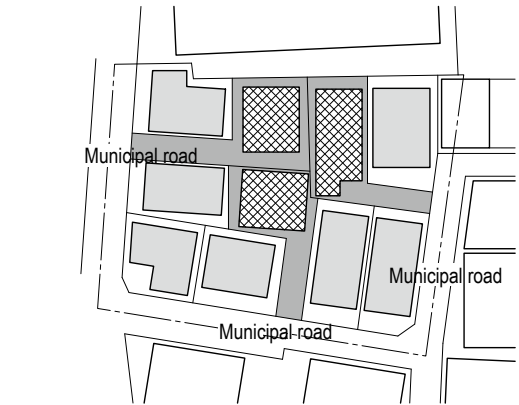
An example of mini development. A former factory site was divided into 10 lots and sold. The lots are extended to fulfill any legal or contractual requirements for connecting to a road.
